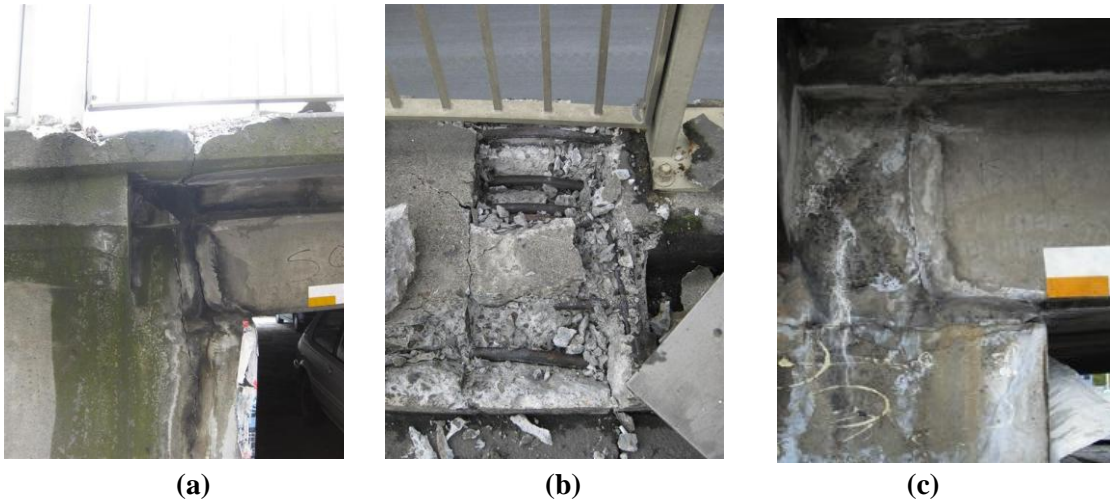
Damage at southwest deck/abutment connection a) Tension cracks due to separation of deck/abutment during ground shaking (b) Buckling of reinforcement in reinforced concrete kerb (c) Minor cracking in northeast beam/abutment connection
